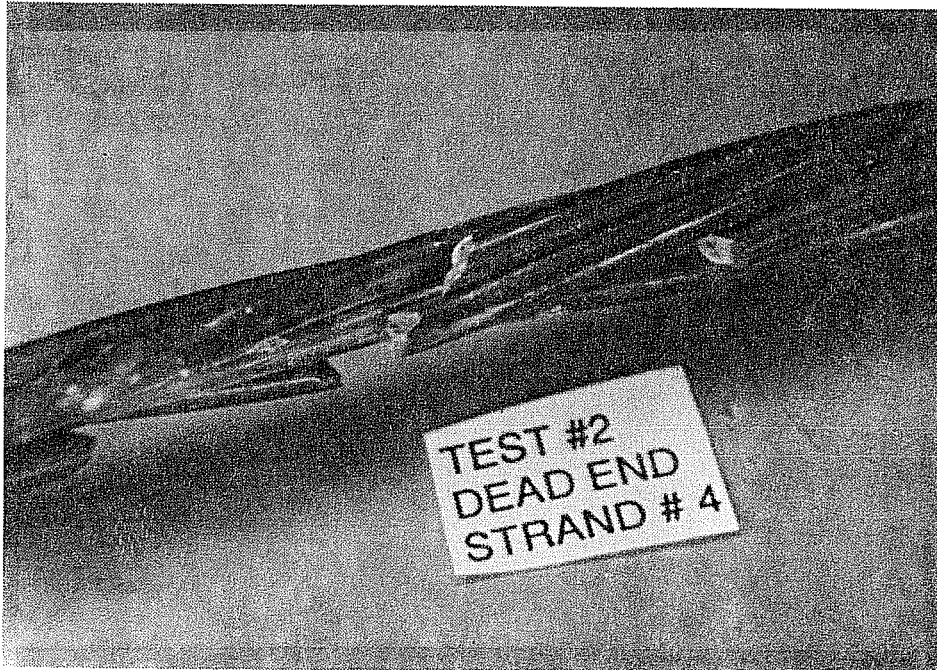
Example of Test #2 fracture surfaces.
